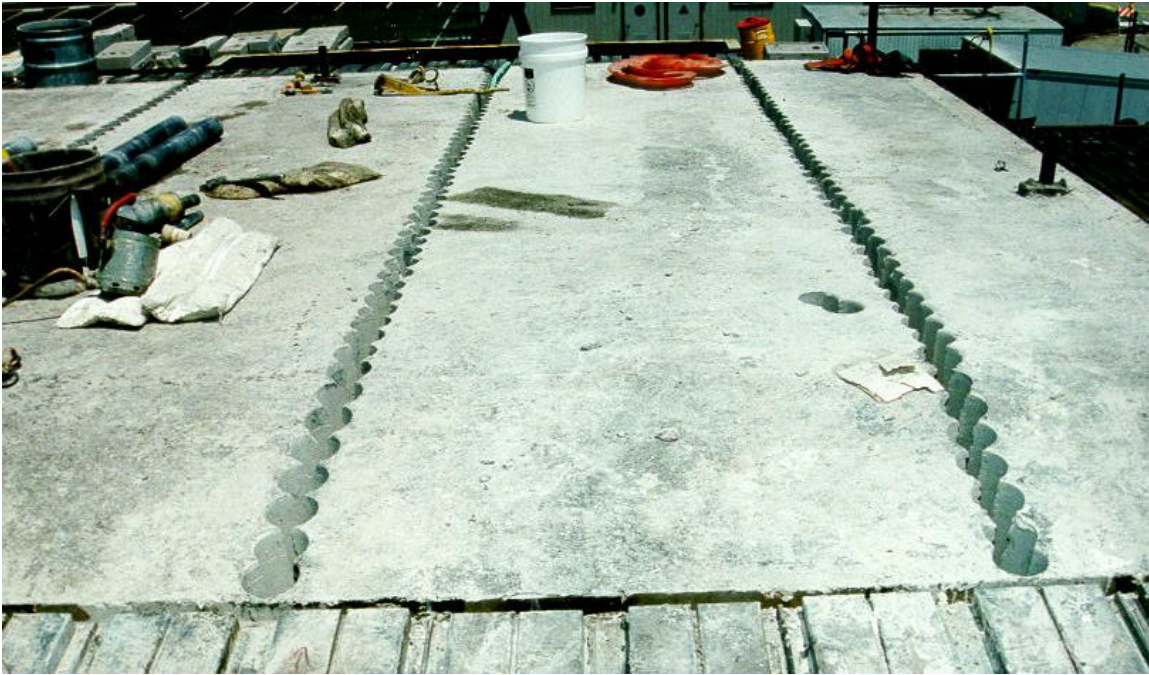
Core-Drilled Concrete Cell Roof Block Segment. [ETEC-6/13/96-394608]
